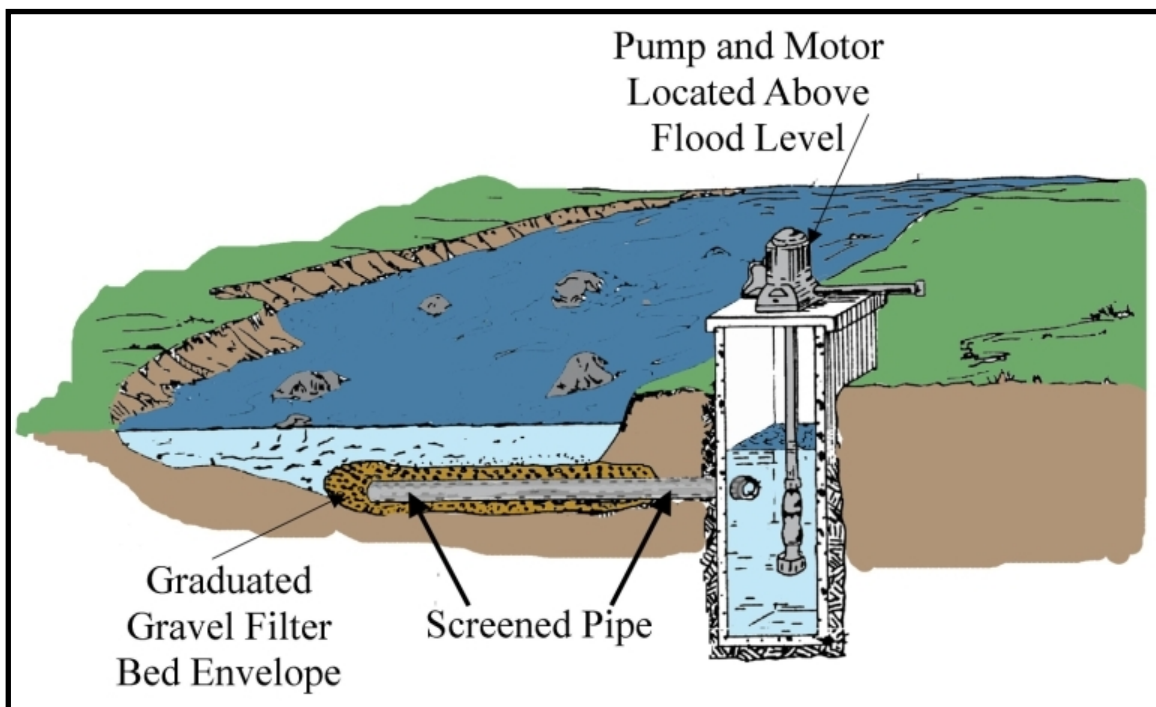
Conceptual Layout of an Infiltration Gallery.
